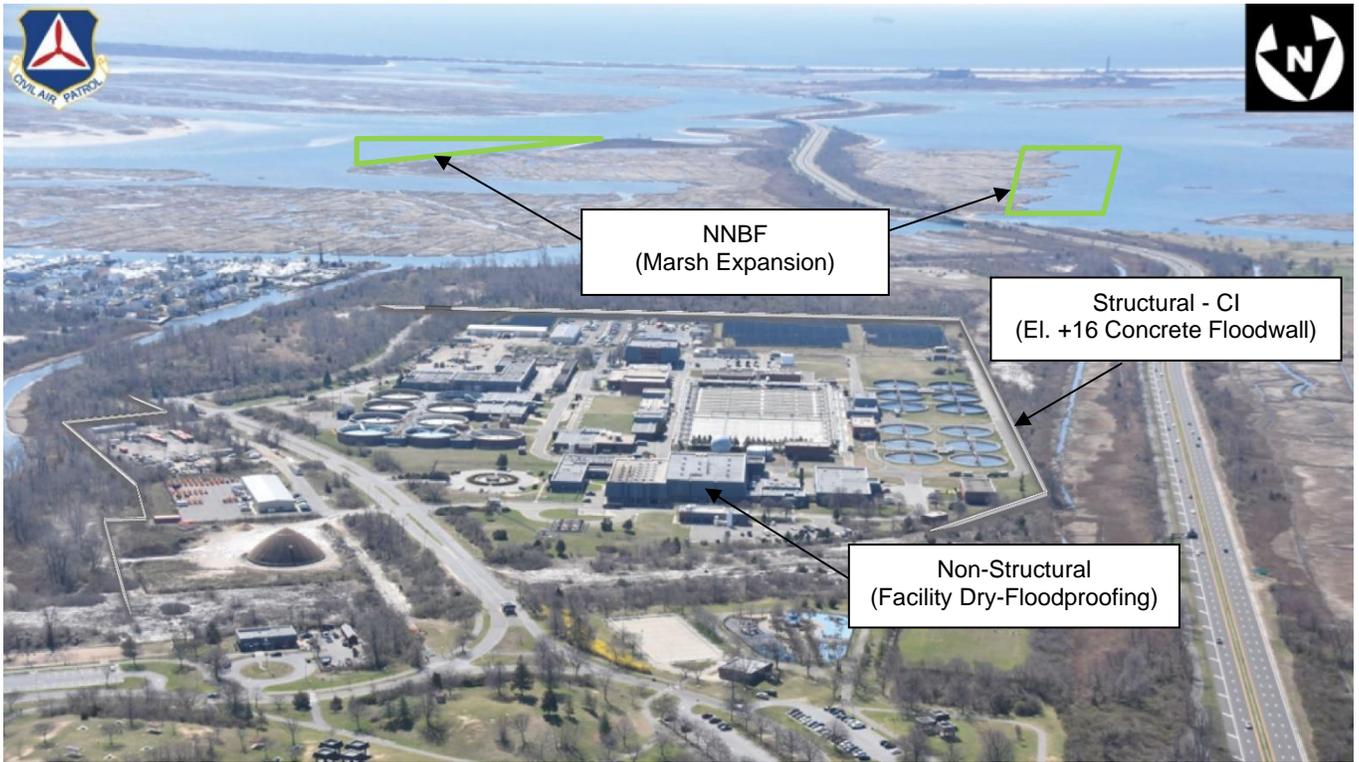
Wantagh Treatment Plant Conceptual Critical Infrastructure Plan
